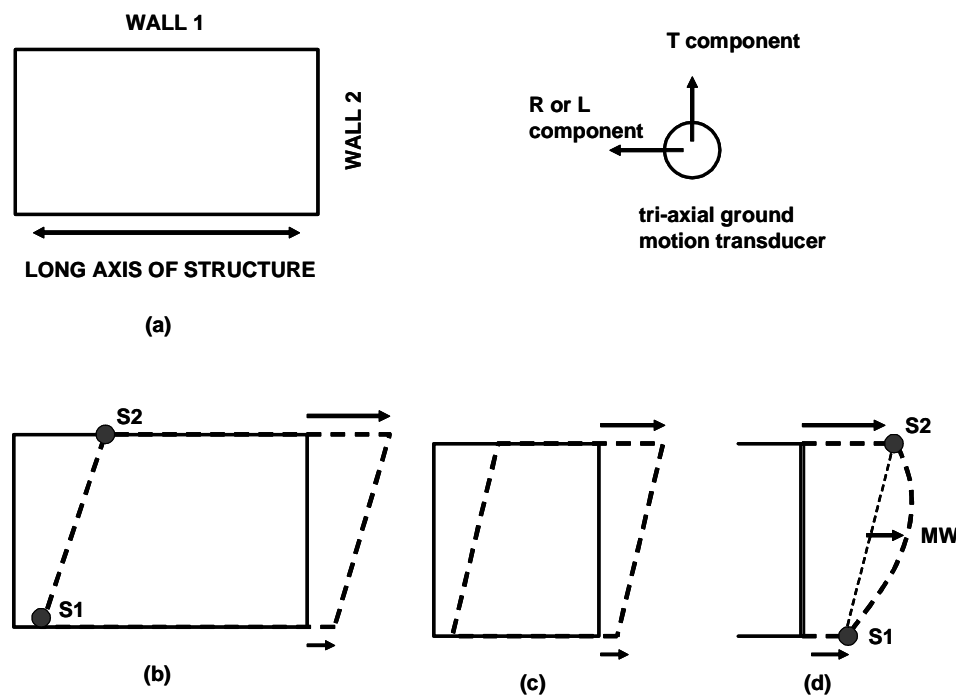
(a) Plan view of structure showing nomenclature for walls, (b) wall 1 and (c) wall 2 whole structure shearing, and (d) typical mid-wall bending
